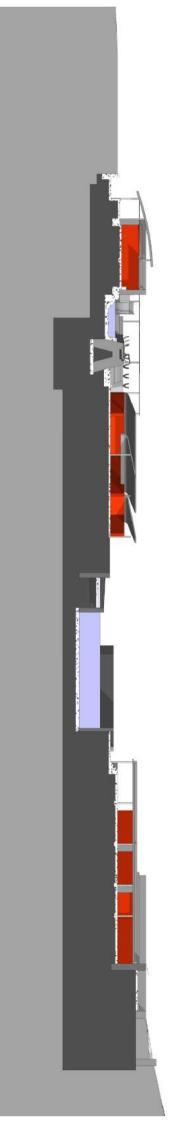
Design iteration, Section, facing north (Author, 2019)
